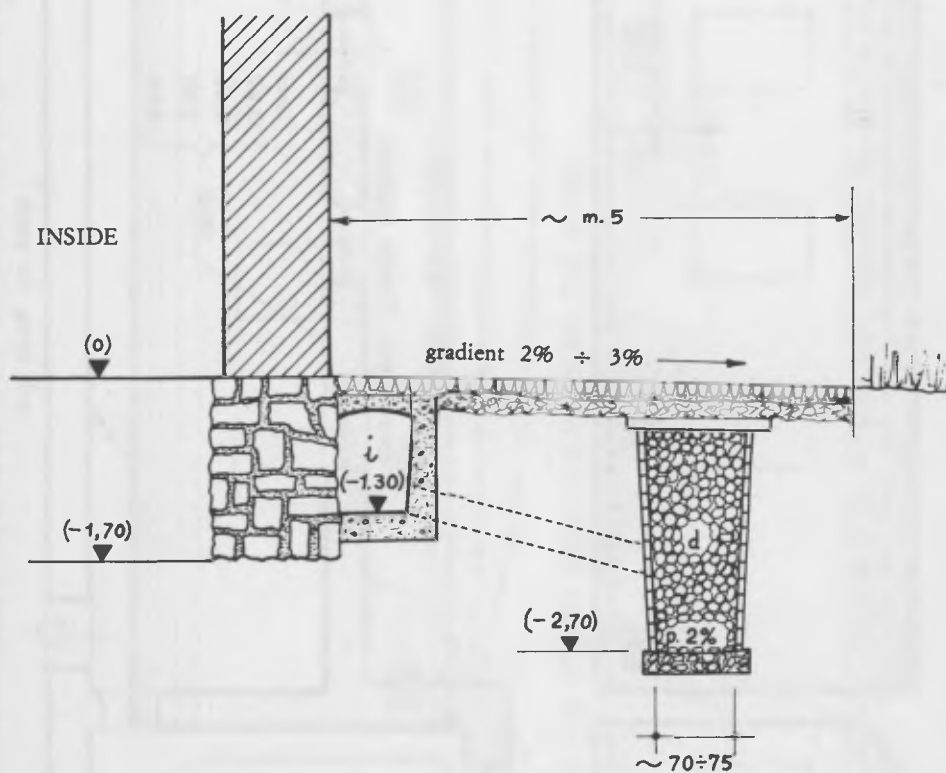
Scheme for floor drainage surrounding an old villa in the country near Rome to prevent damp ascending in the walls.
